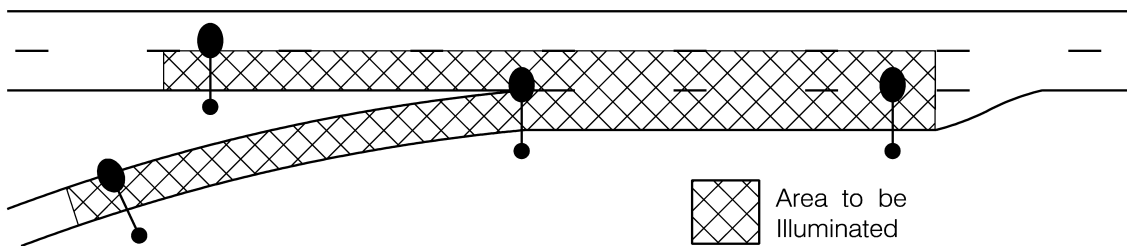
Complex Intersection, Typical Lighting Layout and Area to be Illuminated
